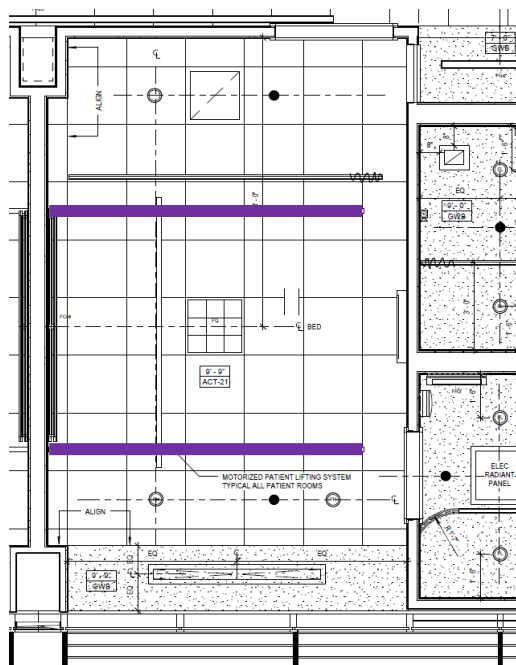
A: Reflected Ceiling Plan (Typ. Patient Room)
